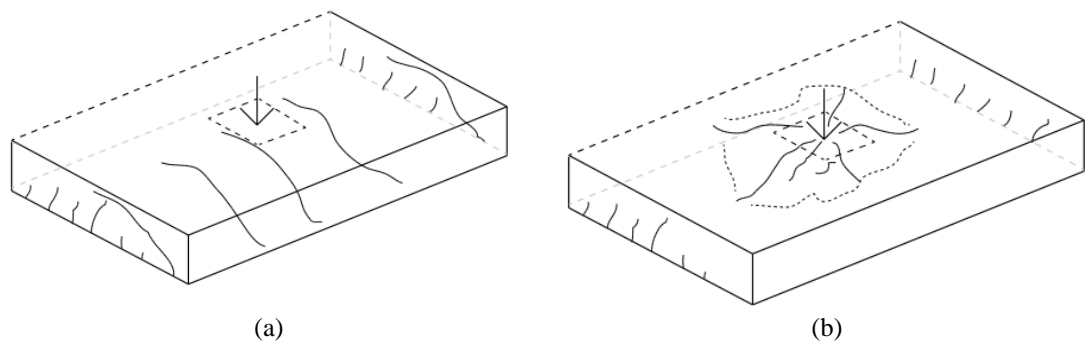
Case RS4: Assumed crack pattern for: (a) beam shear failure, (b) punching shear failure (Lantsoght, 2013)
